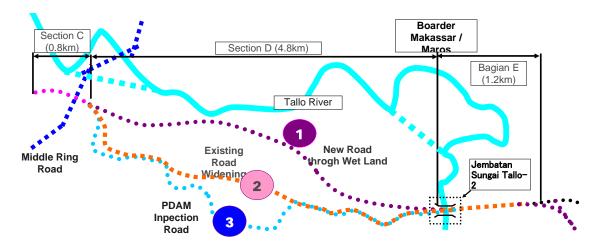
Alternative Road Improvement Plans for Section D
